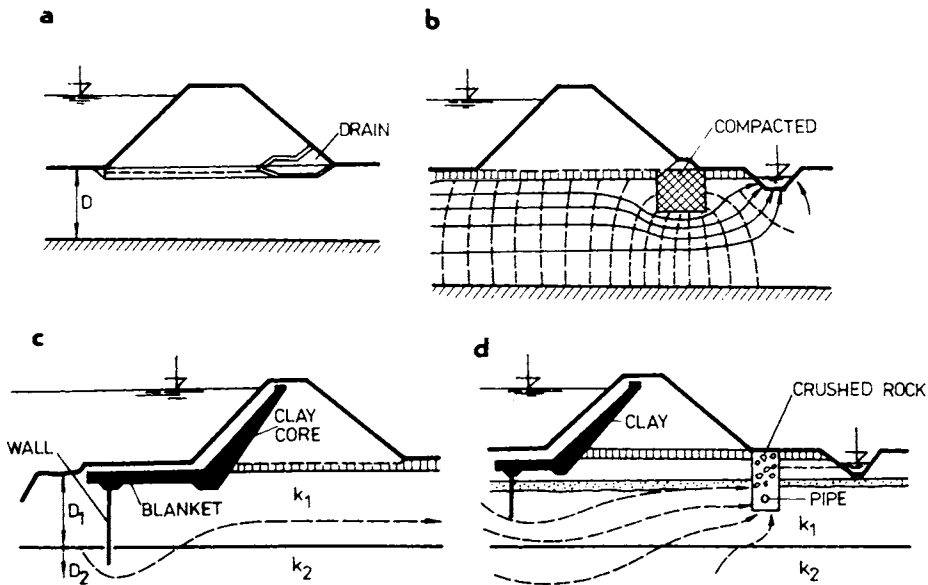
Elements of active and passive protection of levées sub-base. a — gravel toe drain, b — drain and compacted subsoil on the toe, c — clay blanket and deep slurry trench wall, d — shallow wall and seepage channel.
